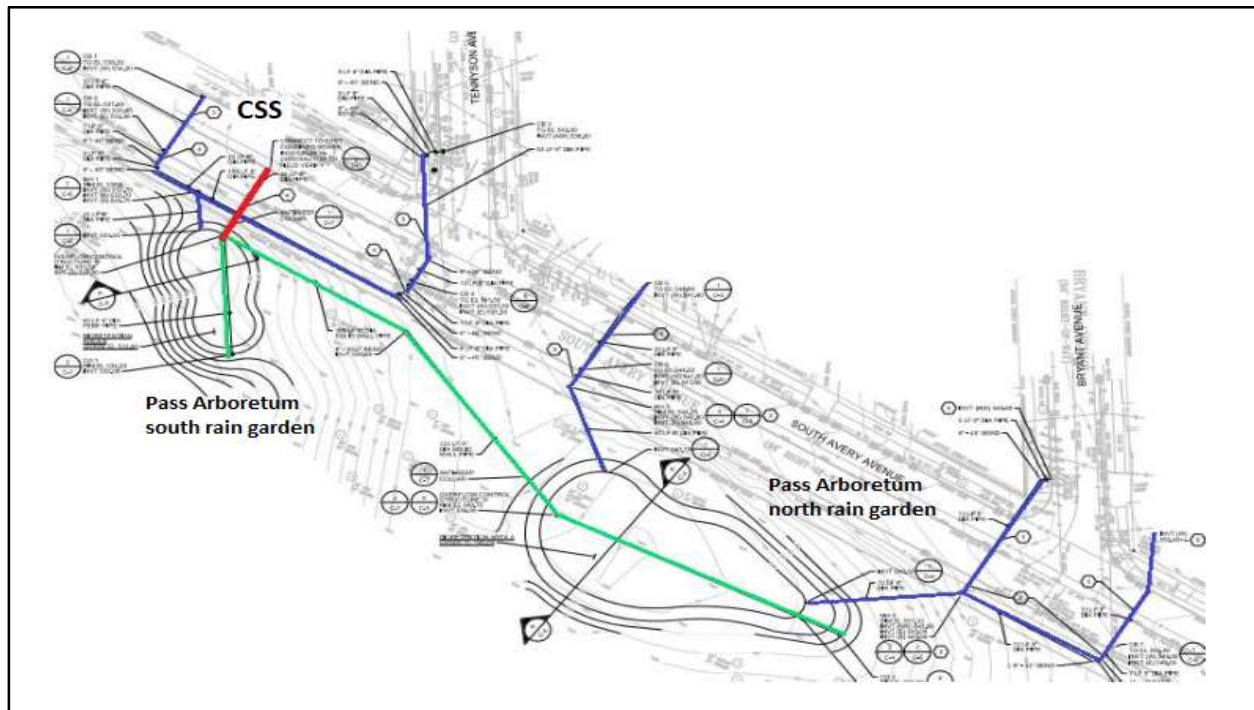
Plan View for Pass Arboretum North and South Rain Garden
